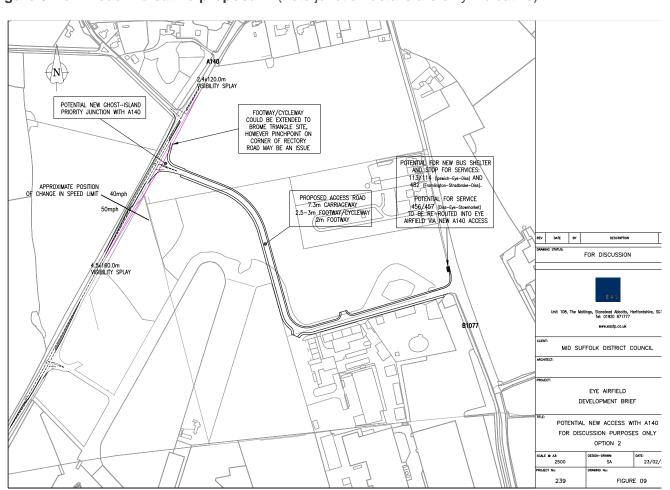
New Road indicative proposal – (note junction details are only indicative)
